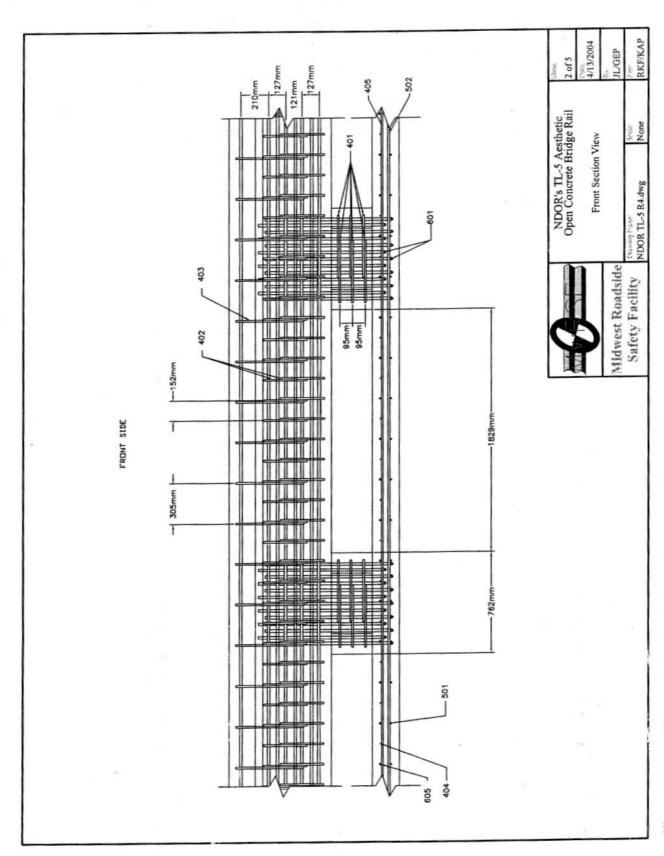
NDOR's TL-5 Aesthetic Open Concrete Bridge Rail Design Details
